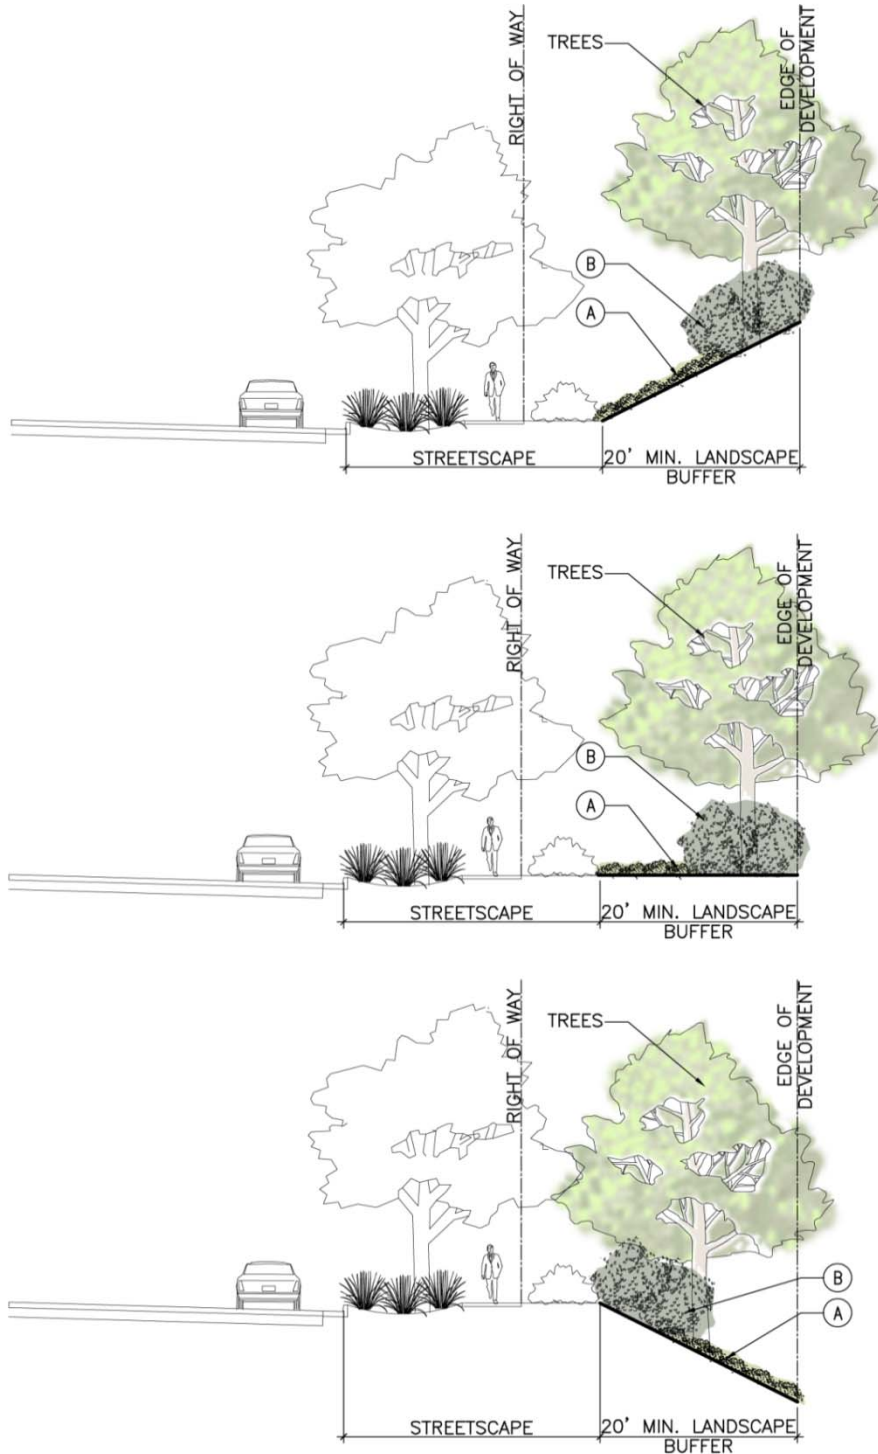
Slope Planting Guideline (From Top: Up-slope, Flat-slope, Down-slope)
